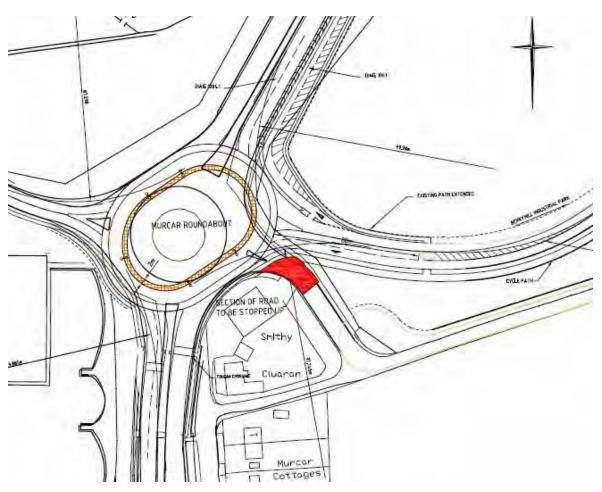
Murcar Roundabout Proposed Upgrade
